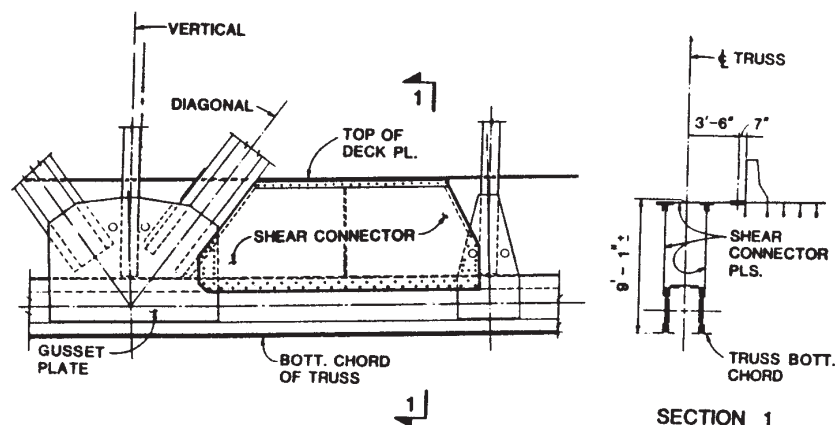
Benjamin Franklin Bridge - shear connectors.
